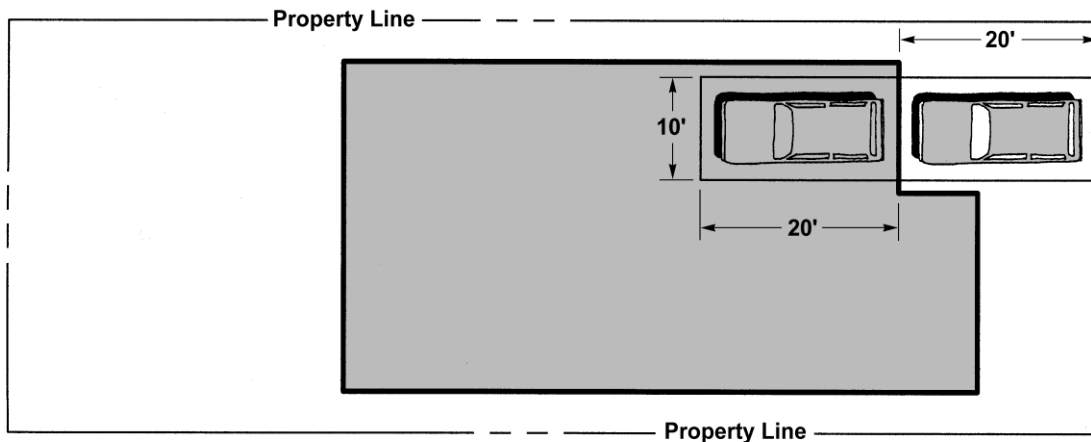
Parking Space Shown in Front Yard Area with Minimum 20' Setback to Building
